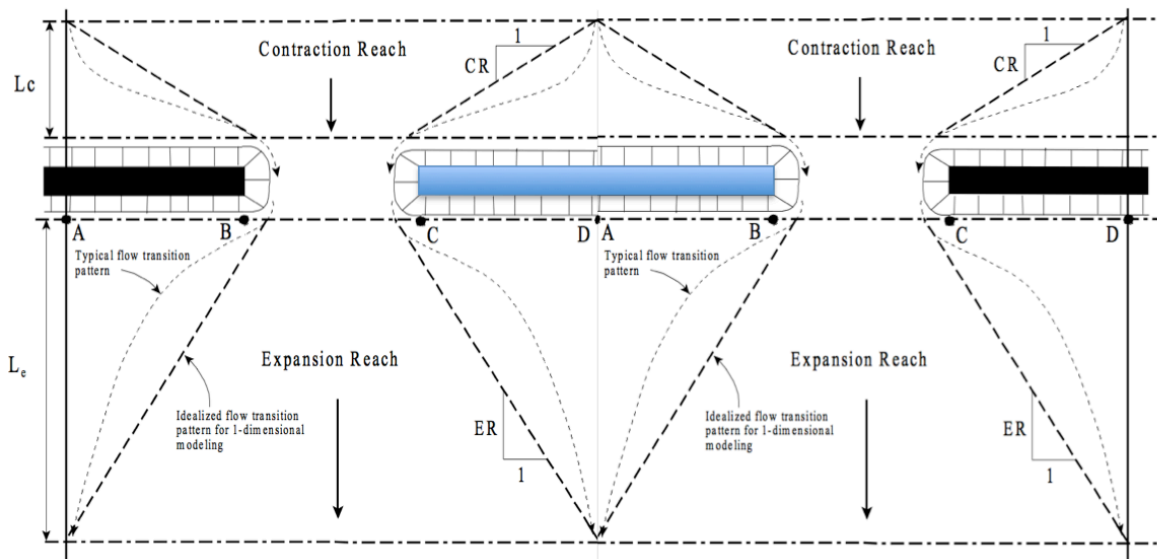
cross section location at a bridge (adapted from Brunner, 2010).
